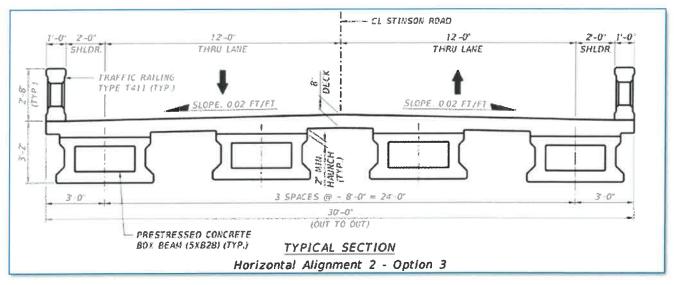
TxDOT Prestressed Concrete XBeams (5XB28) Typical Section
